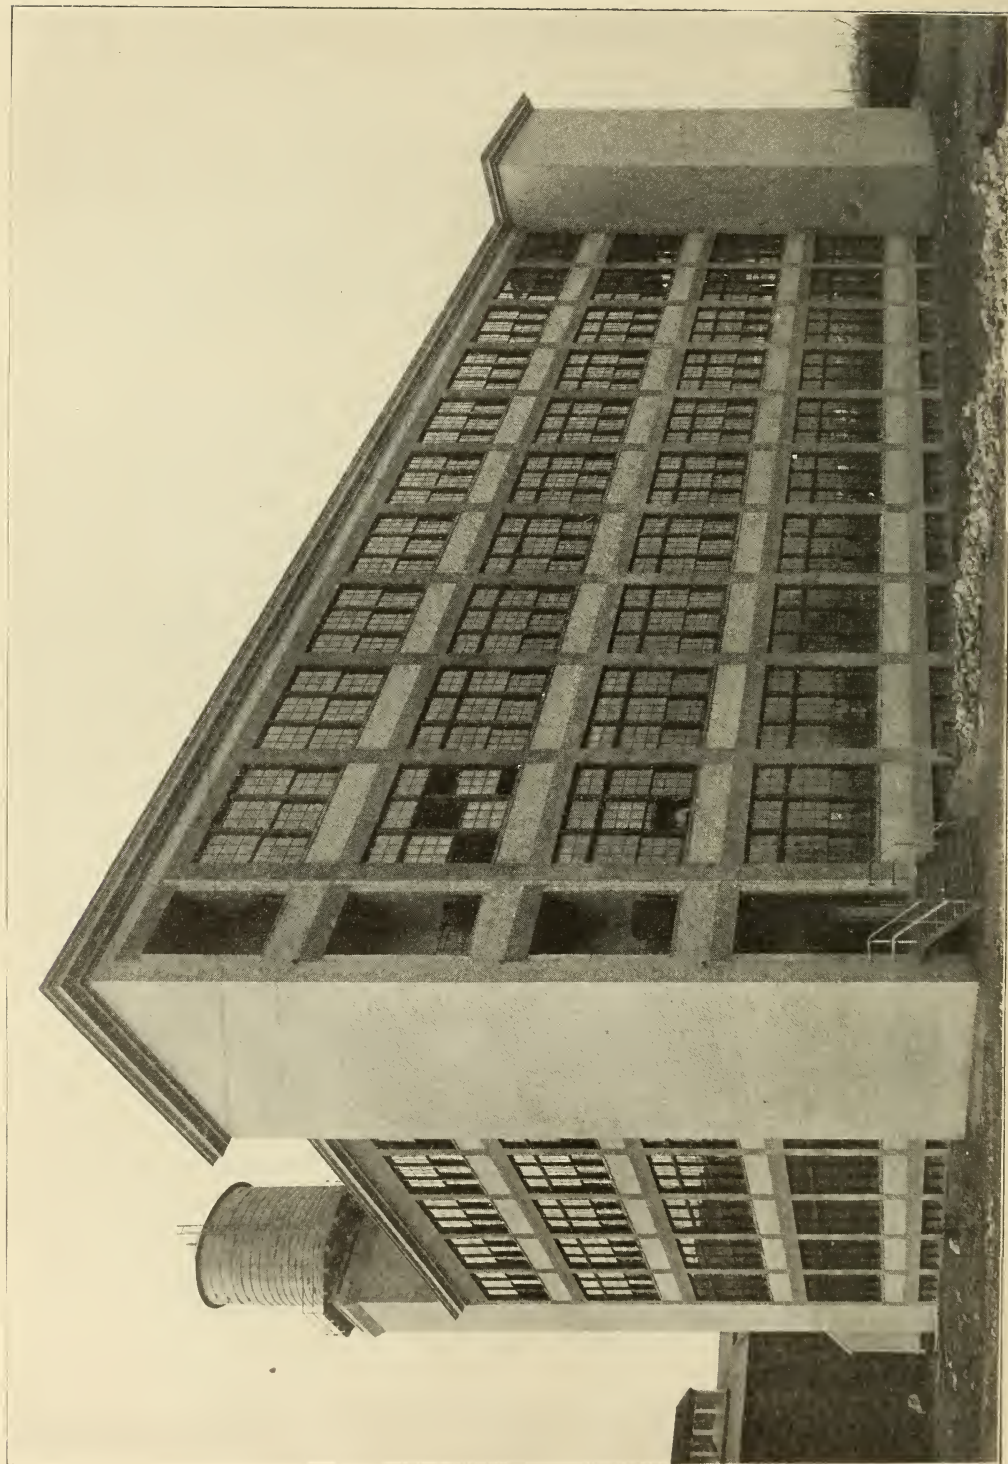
Exterior of Factory Building for the Erben-Harding Company, Philadelphia, Pa.
